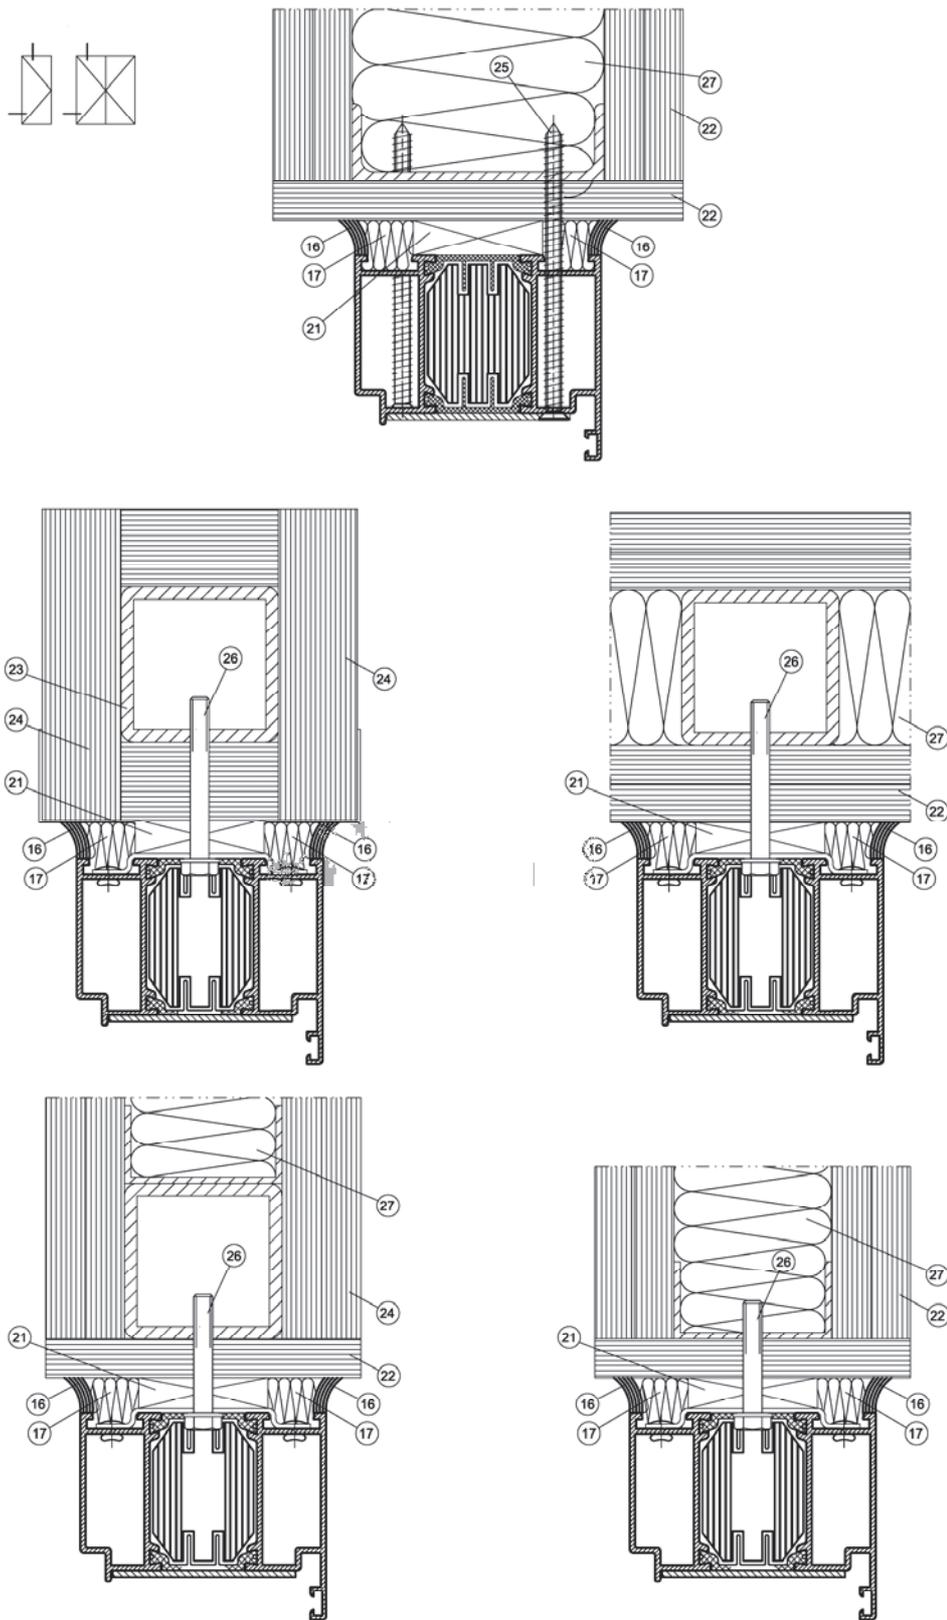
Sealing variants for frame connections in doors, technical windows and door system frames rated EI30, embedded in framed flexible walls clad with plasterboards
